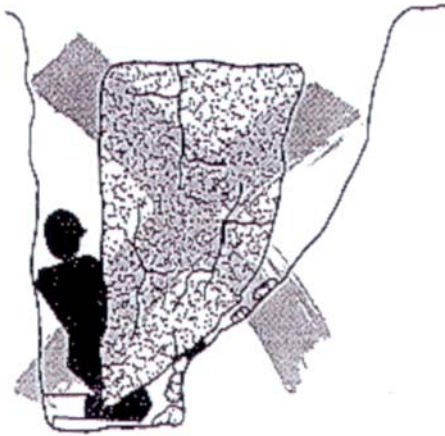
(c): Worker trapped and crushed against the trench wall by the quick collapse
